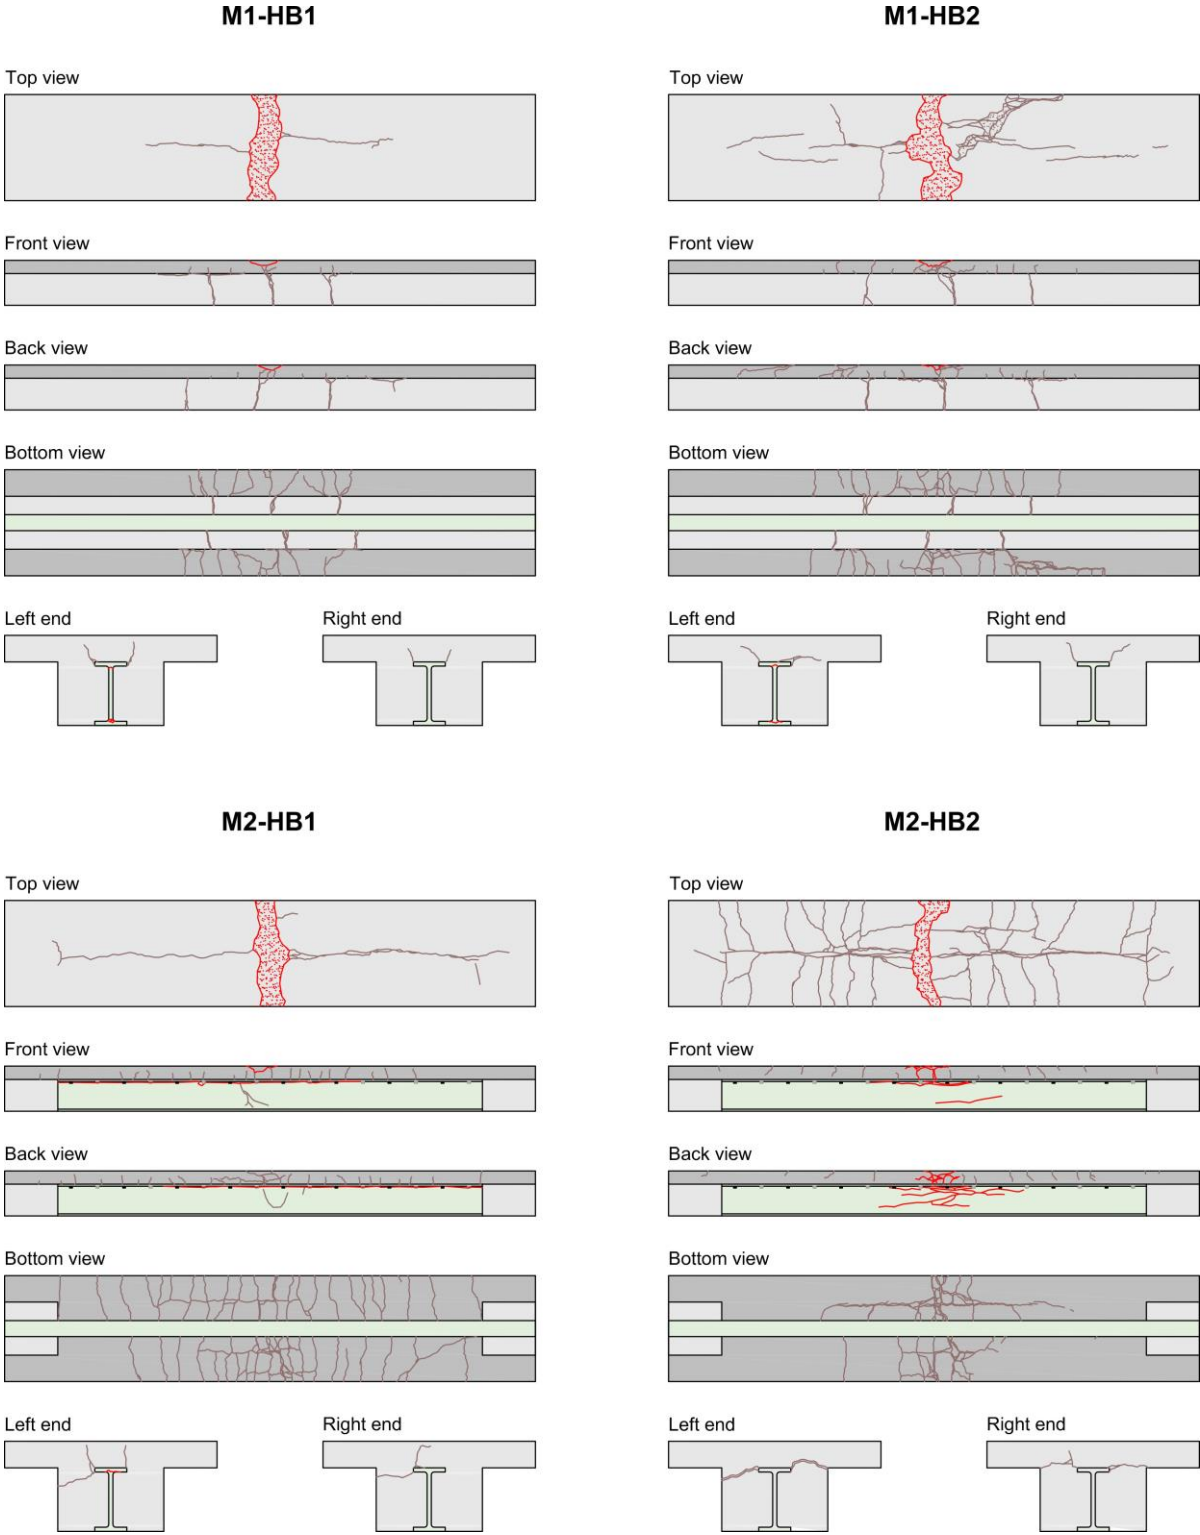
Visible crack patterns of hybrid beams in test setup I. Failure cracks and crushing areas are indicated in bright red.
